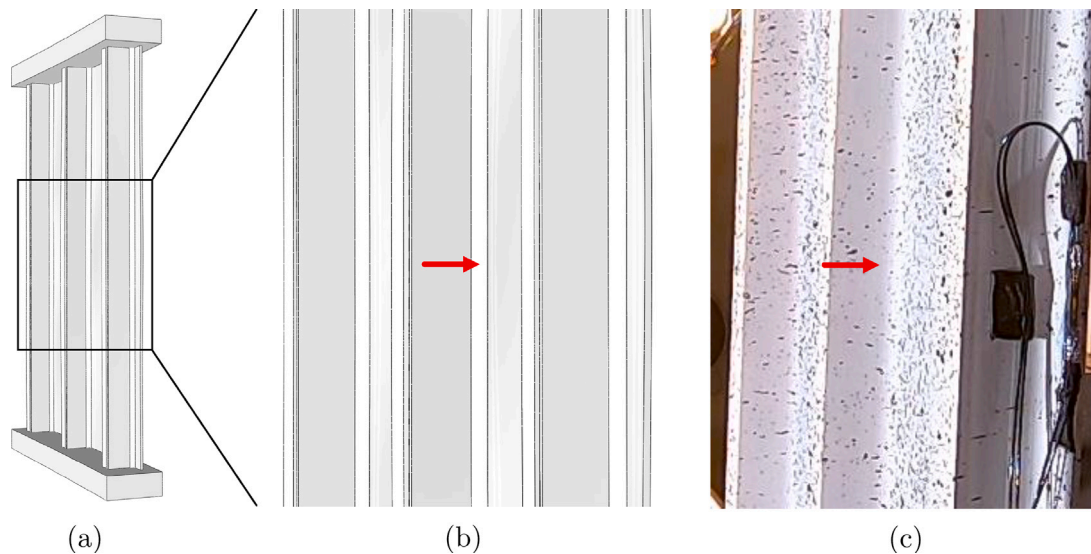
Closed crack seen from right side of panel 1 at 156 kN: (a) full view of panel; (b) close-up FE; (c) close-up camera footage.
